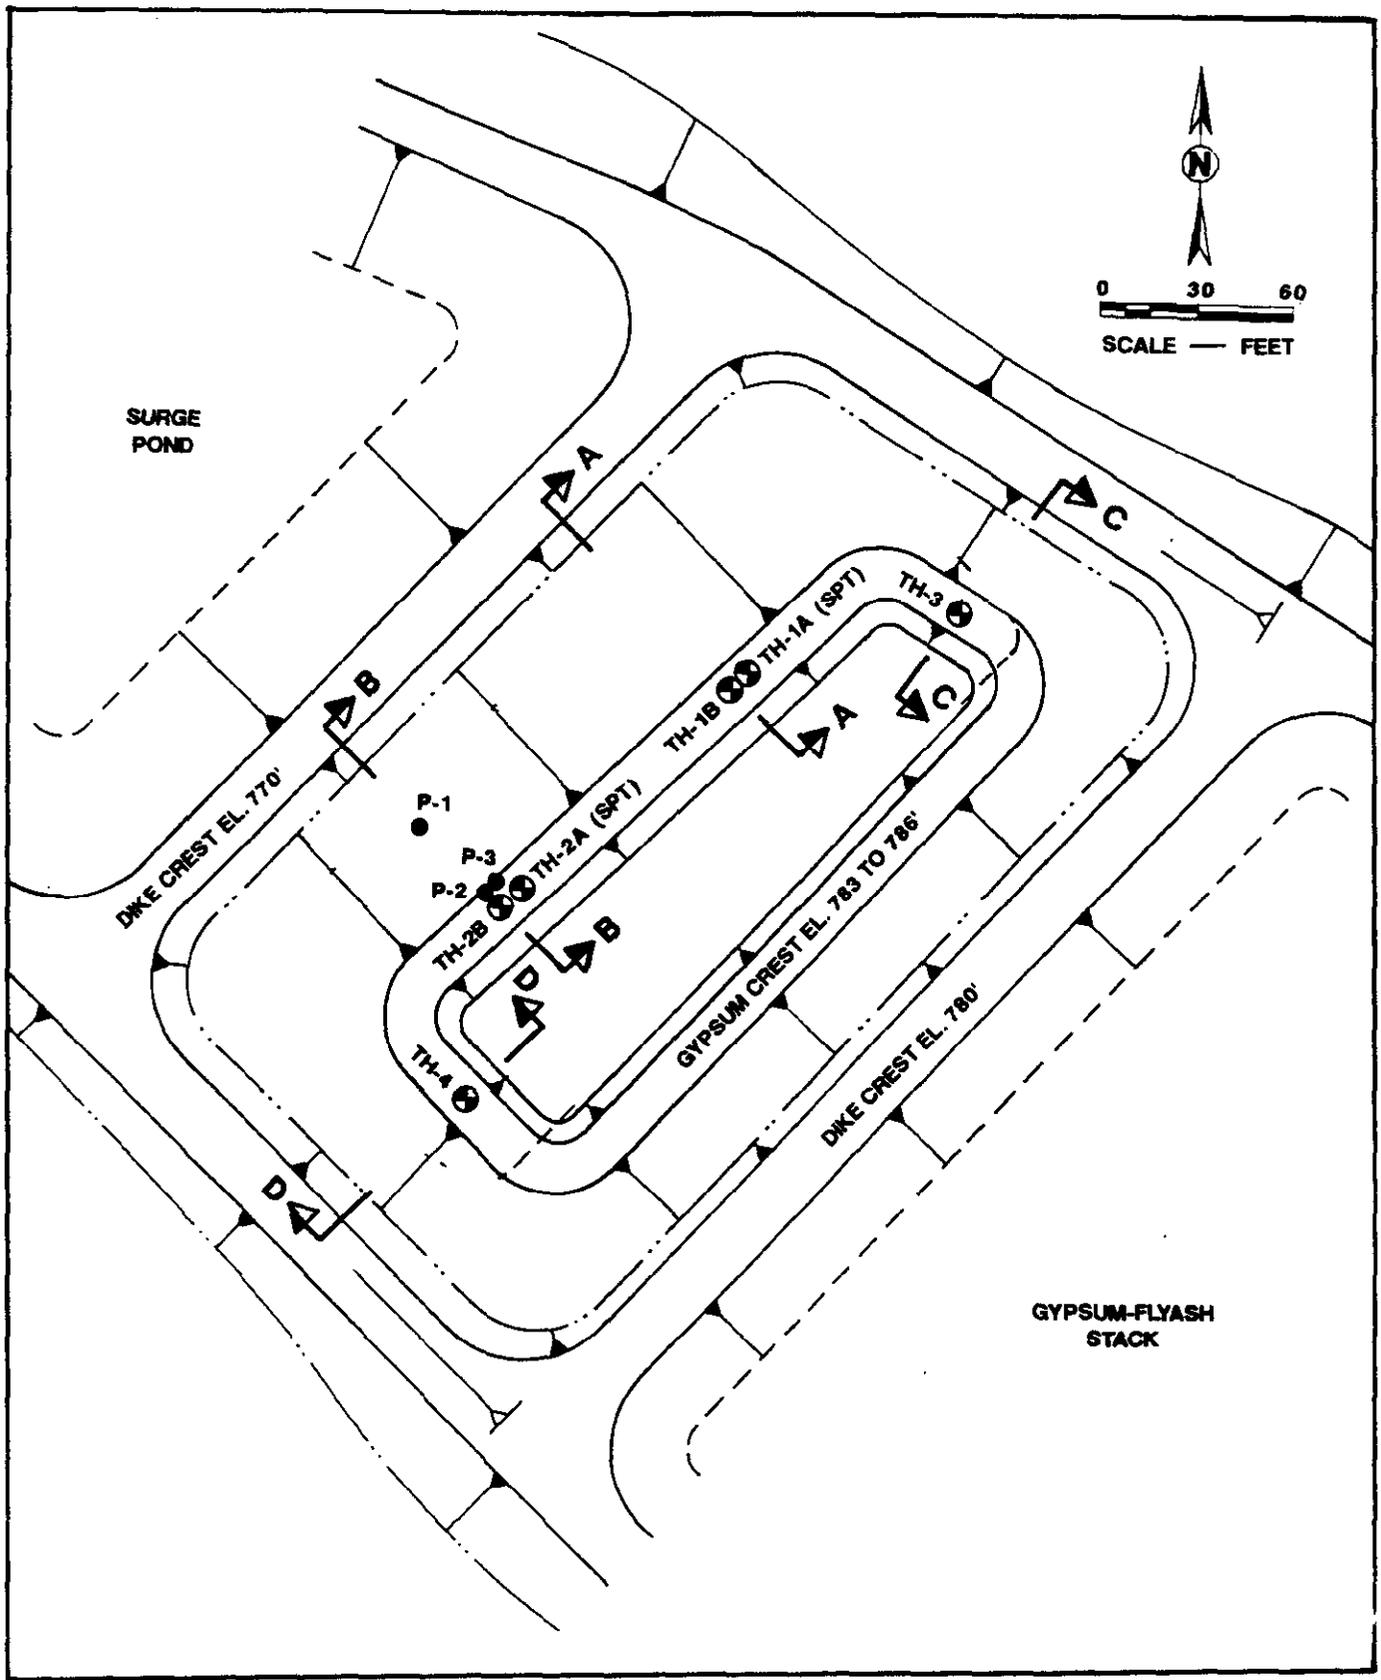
Approximate As-Built Plan and Field Test Location Plan for Gypsum Stack
